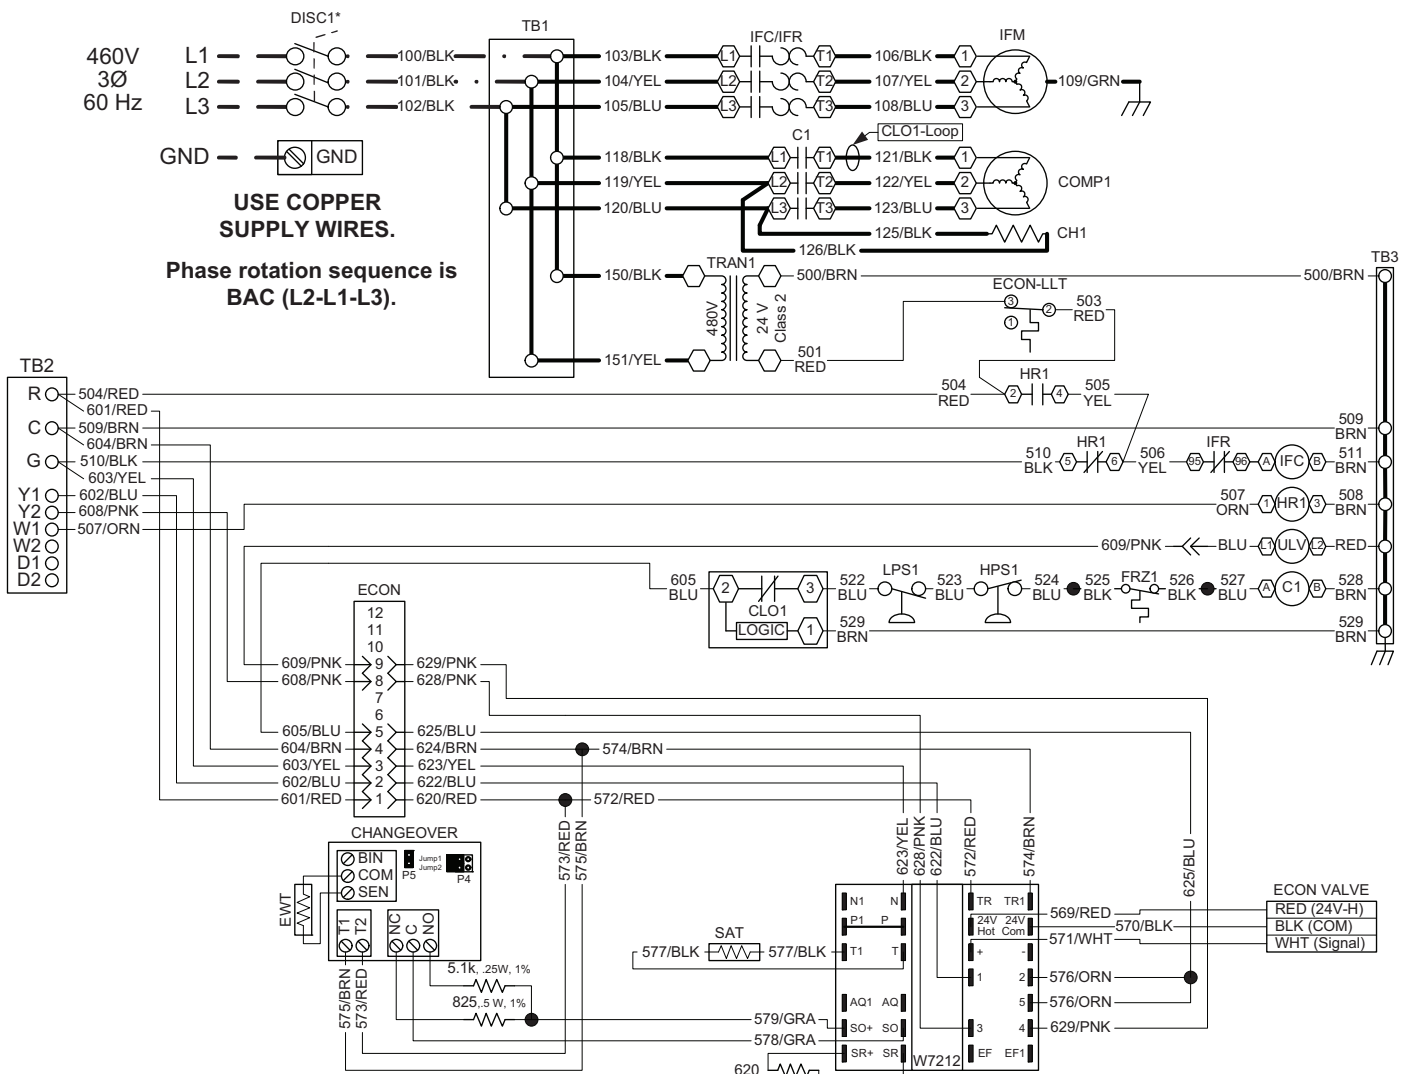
50XCW06-08 — 460-v Units with Economizer Shown
